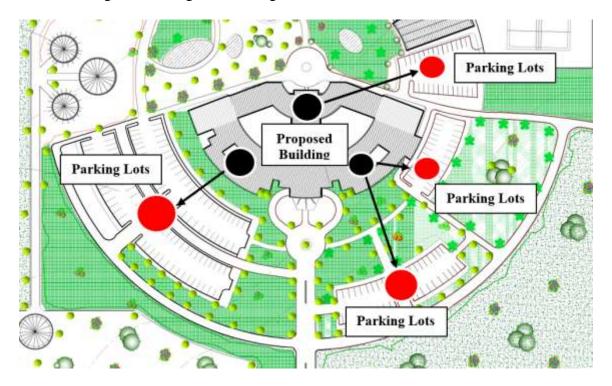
Showing the Zoning of Parking Spaces and Pedestrian Circulation. (Source: Author's Work, 2019)
